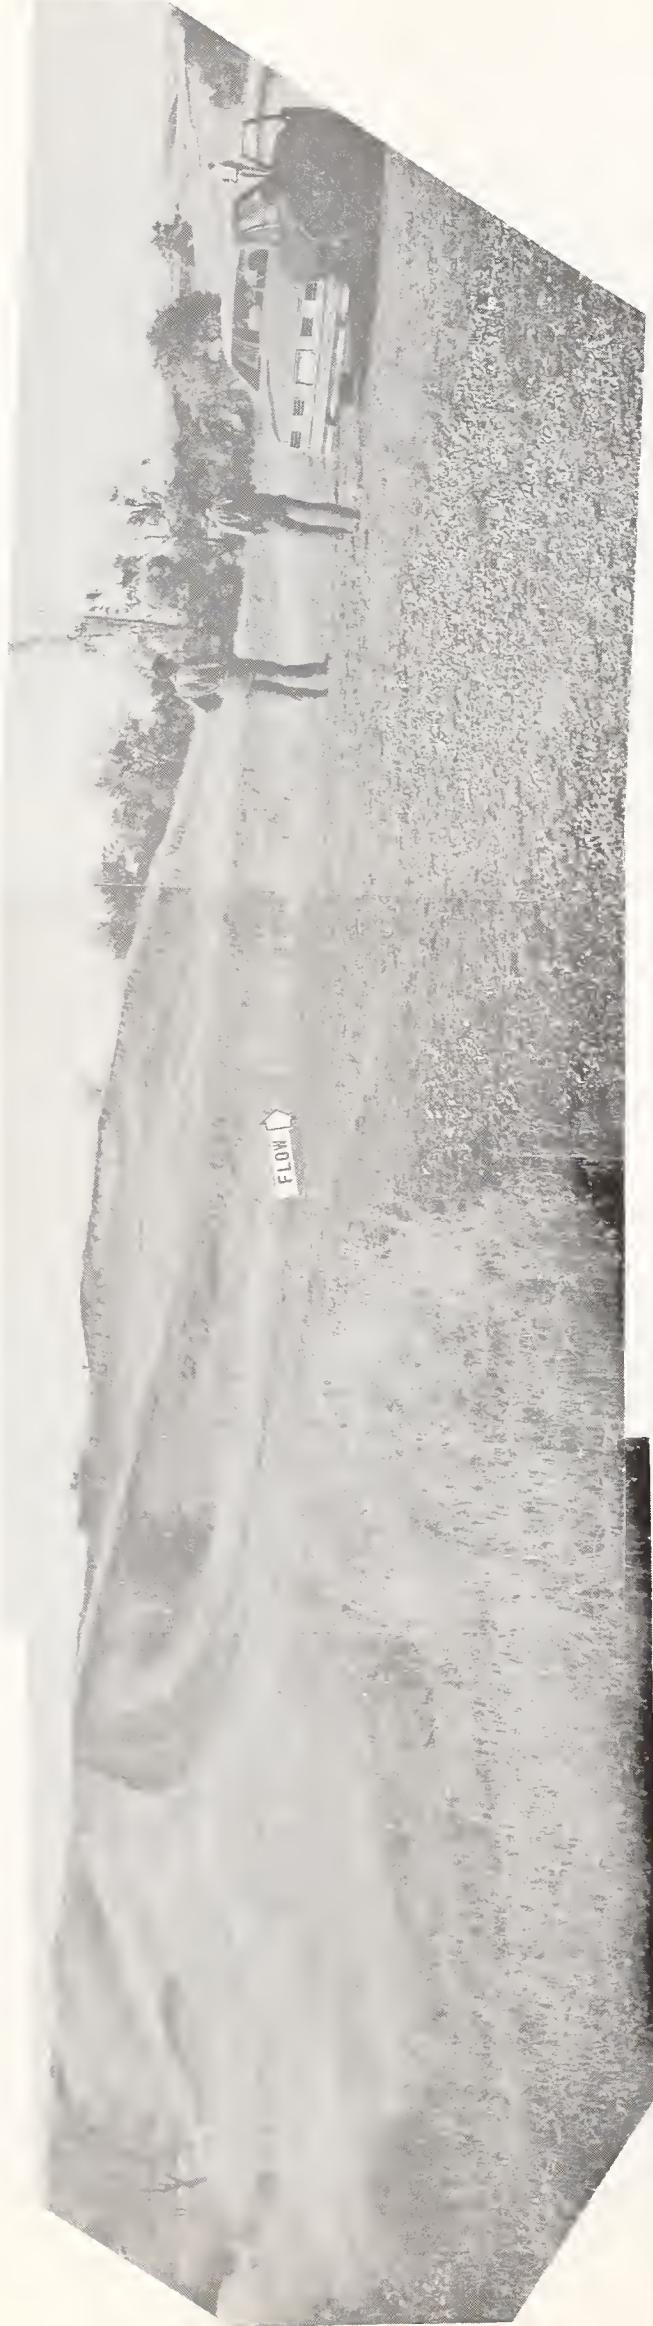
VAUX #1 ABANDONED SPILLWAY AT NORTH ABUTMENT
